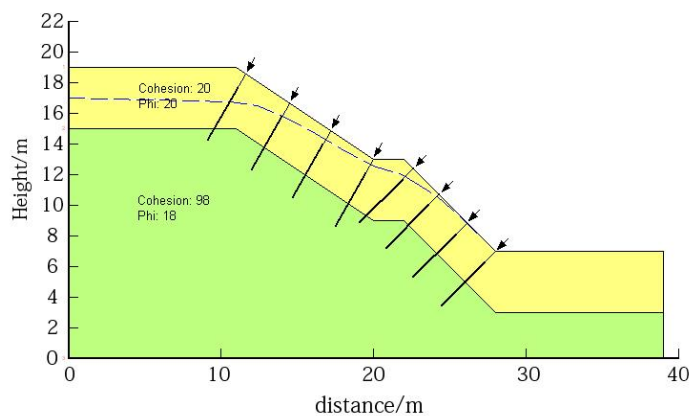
Stability of expansive soil slope after reinforcement(rainy day)
